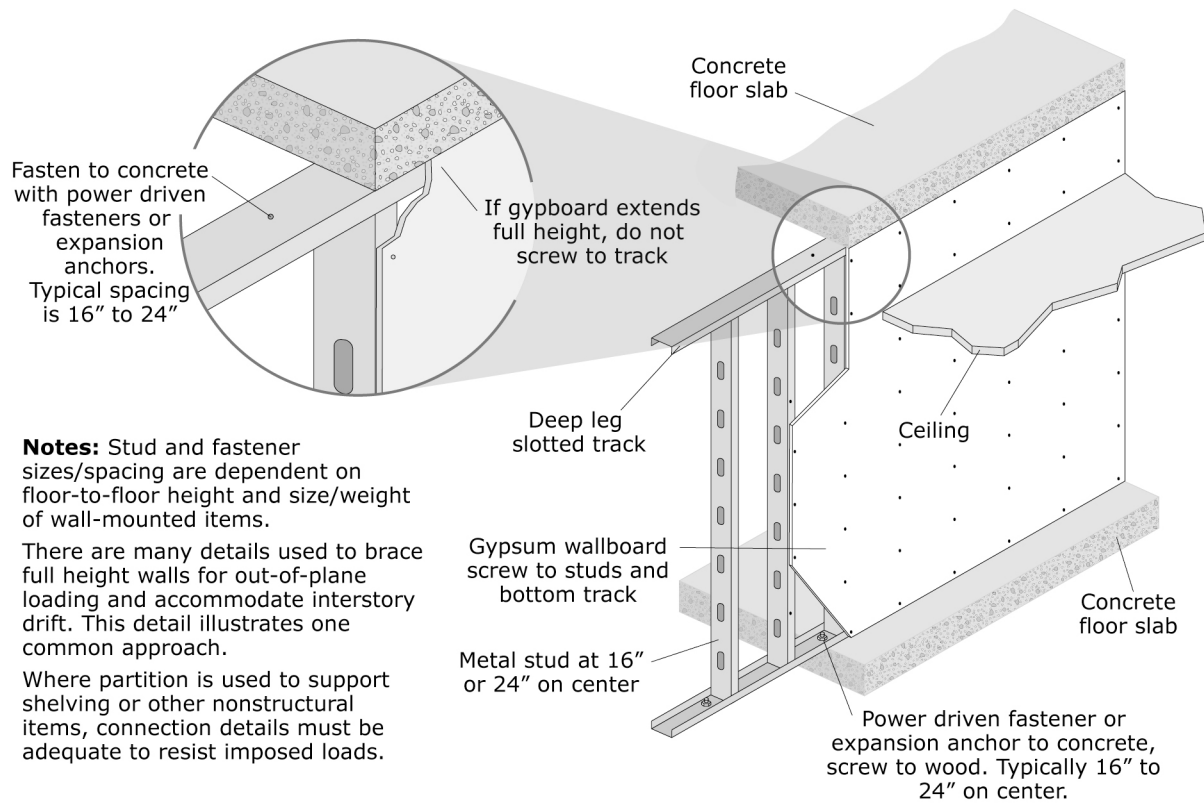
Full height nonbearing stud wall (ER).
